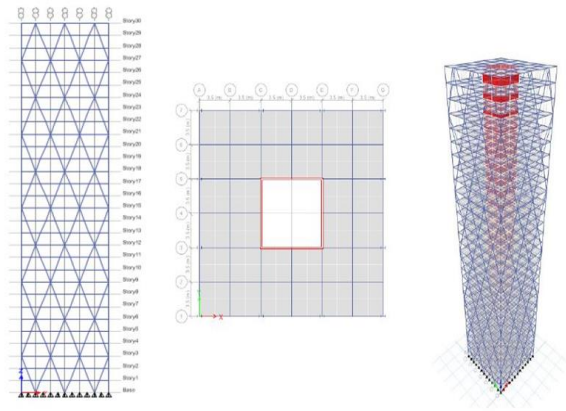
Elevation, Plan and 3-D View of 30-Storey Diagrid Structural System
